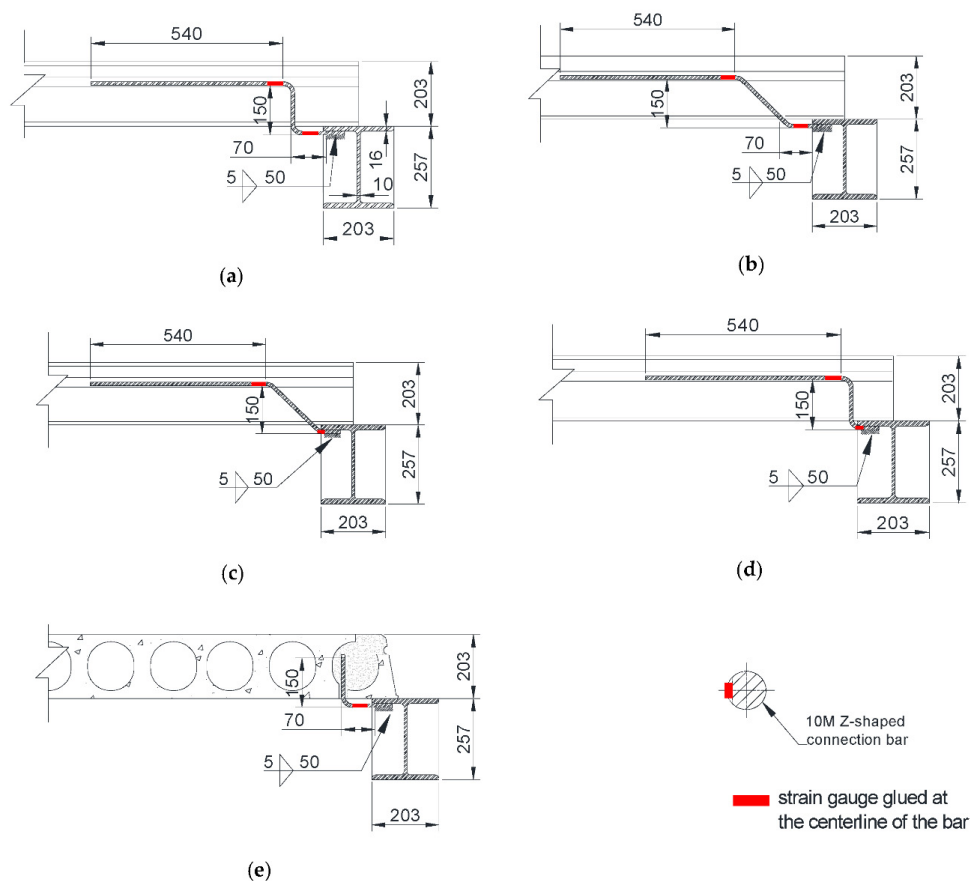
Steel bar connection detailing and locations of strain gauges (all dimensions in mm): (a) 90-degree bend bar—end-bearing connection; (b) 45-degree bend bar—end-bearing connection; (c) Reduced unrestrained bar length for 45-degree bend bar (EB-CN-45R); (d) Reduced unrestrained bar length for 90-degree bend bar (EB-CN-90R); and (e) 90-degree bend bar—side-bearing connections. (Dimensions in mm).
